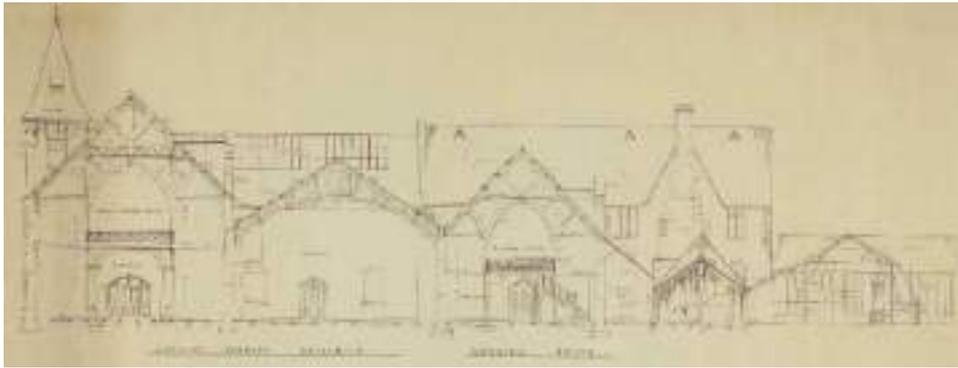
Section through Canterbury Museum from Rolleston Avenue, 1948 showing from L to R: 1877 building, 1882 building, 1870 building, 1872 building behind where in foreground. Structure to the far right may be the shelter for the blue whale
